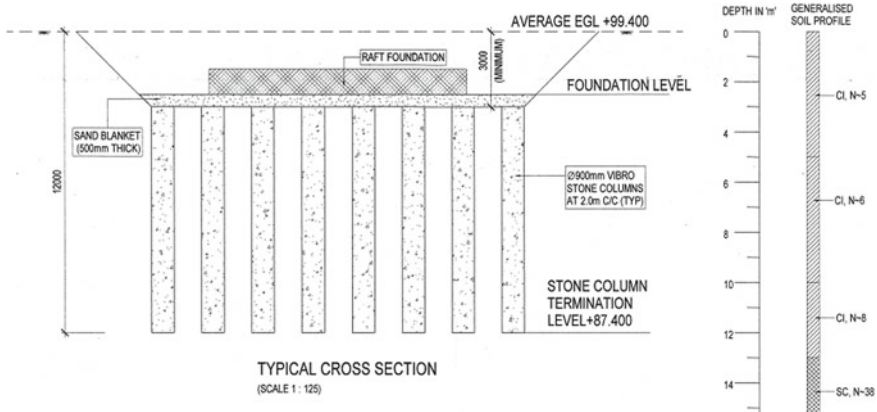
Sketch showing the typical arrangement of stone column below raft
